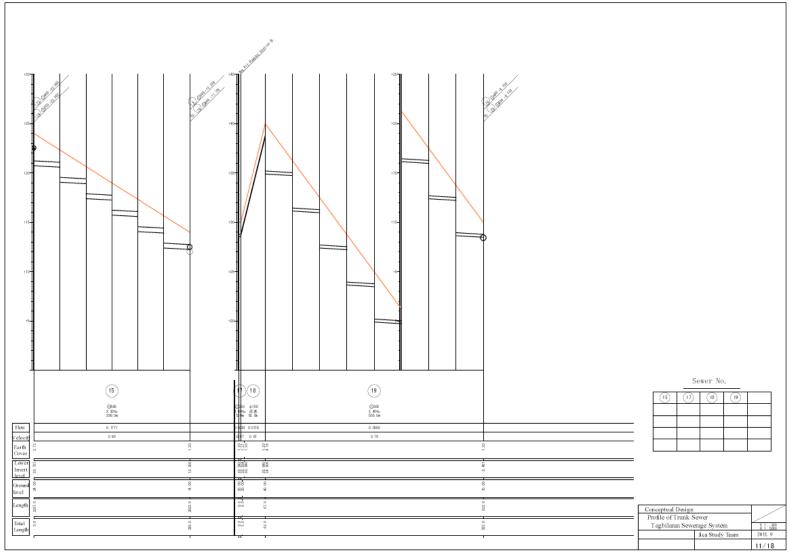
Profile of Trunk Sewer (Tagbilaran Sewerage System)
